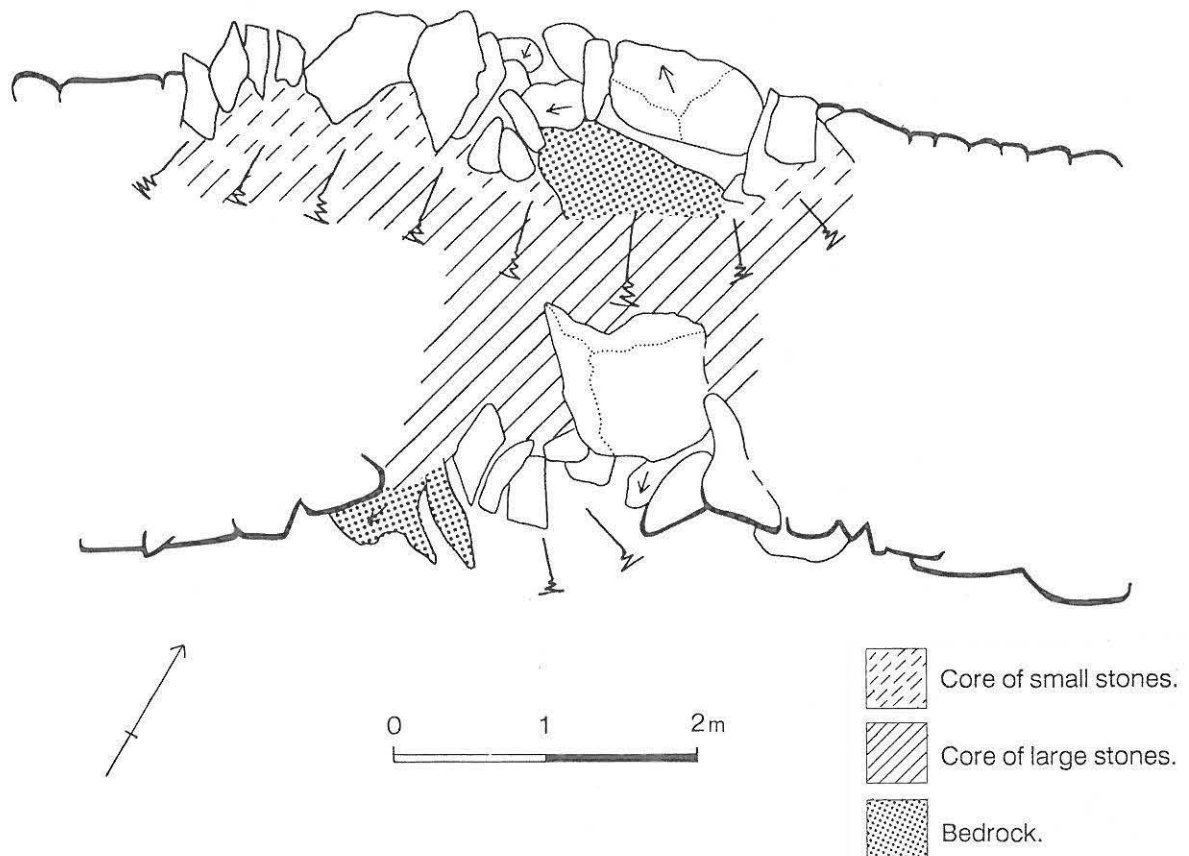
Collapse F after removal of tumble and unstable masonry.
